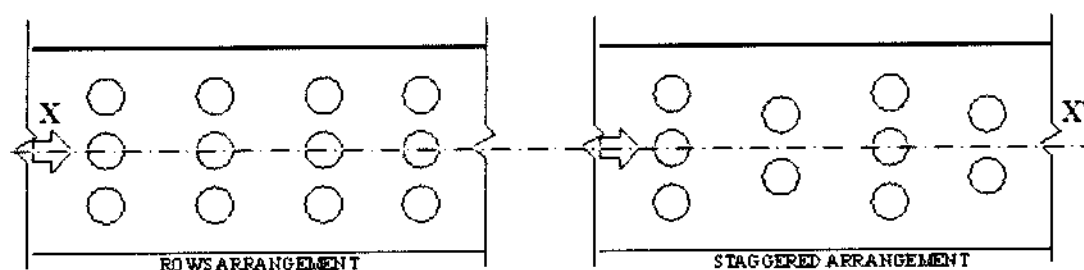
Structured arrangements of boulders on block ramps (not to scale)
